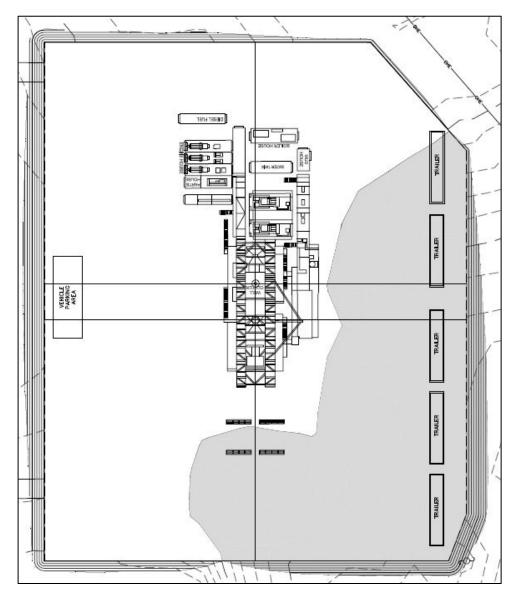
Typical drilling layout for new grass root, replacement, and/or re-entry double well pad during construction.
